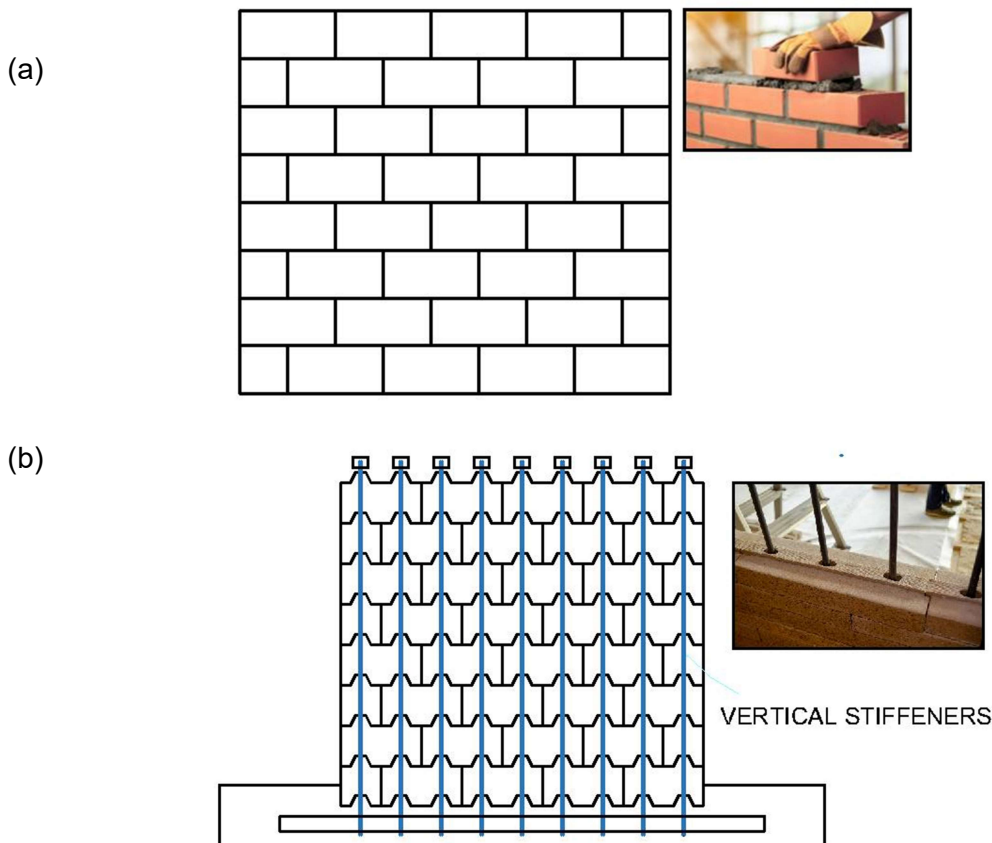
(a) Conventional Masonry Brickwork (b) Mortar free construction with vertical stiffeners
